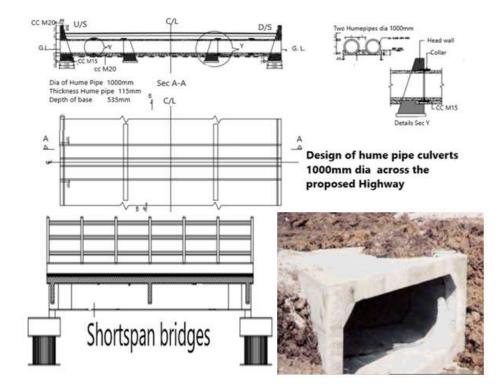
Cross drainage structures (Hume pipe culverts and small bridges) proposed Highwayalong the coastal corridor
